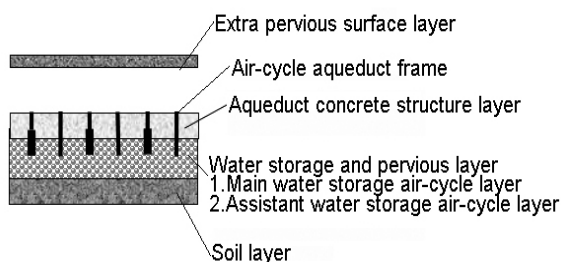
Section of JW Structural Pervious Air-Circulated Aqueduct Concrete Pavement.
